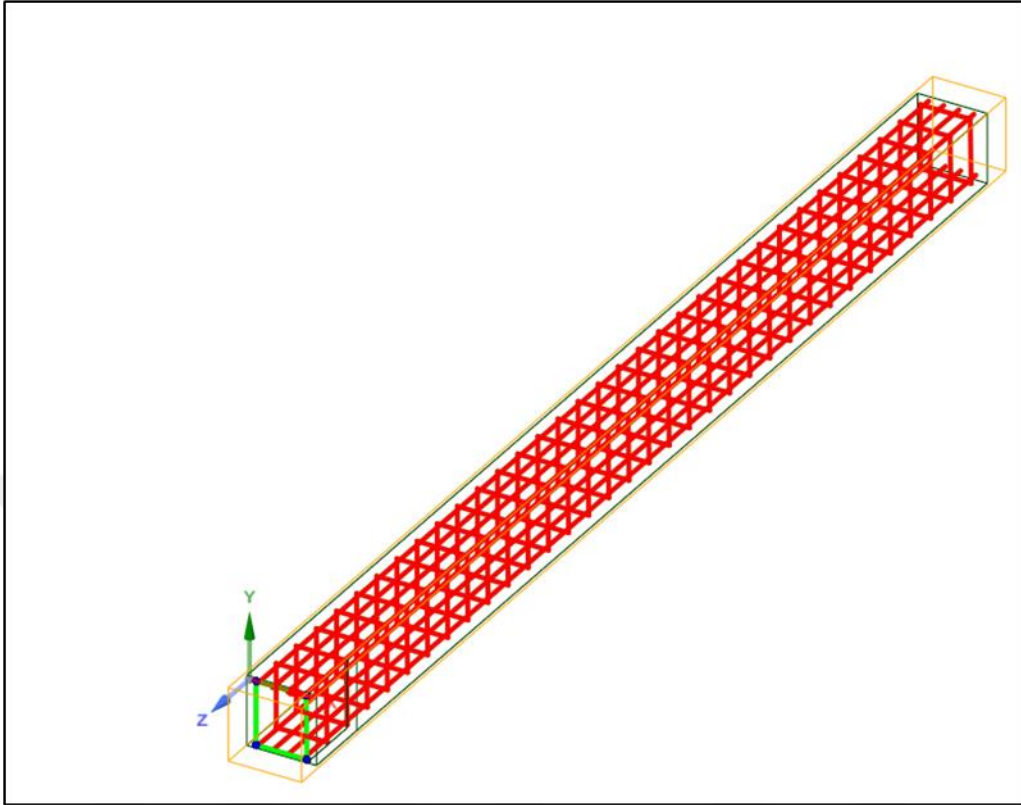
Geometrical Shape Of The Reinforcement Of The Rc Beam (ANSYS)
